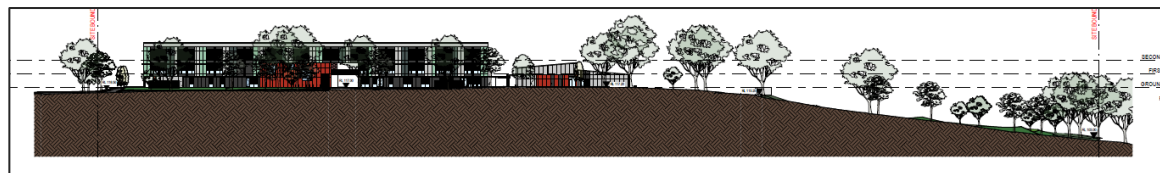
| North-west streetscape elevations of Stage 1 (Source: Applicant's RtS 2021)
